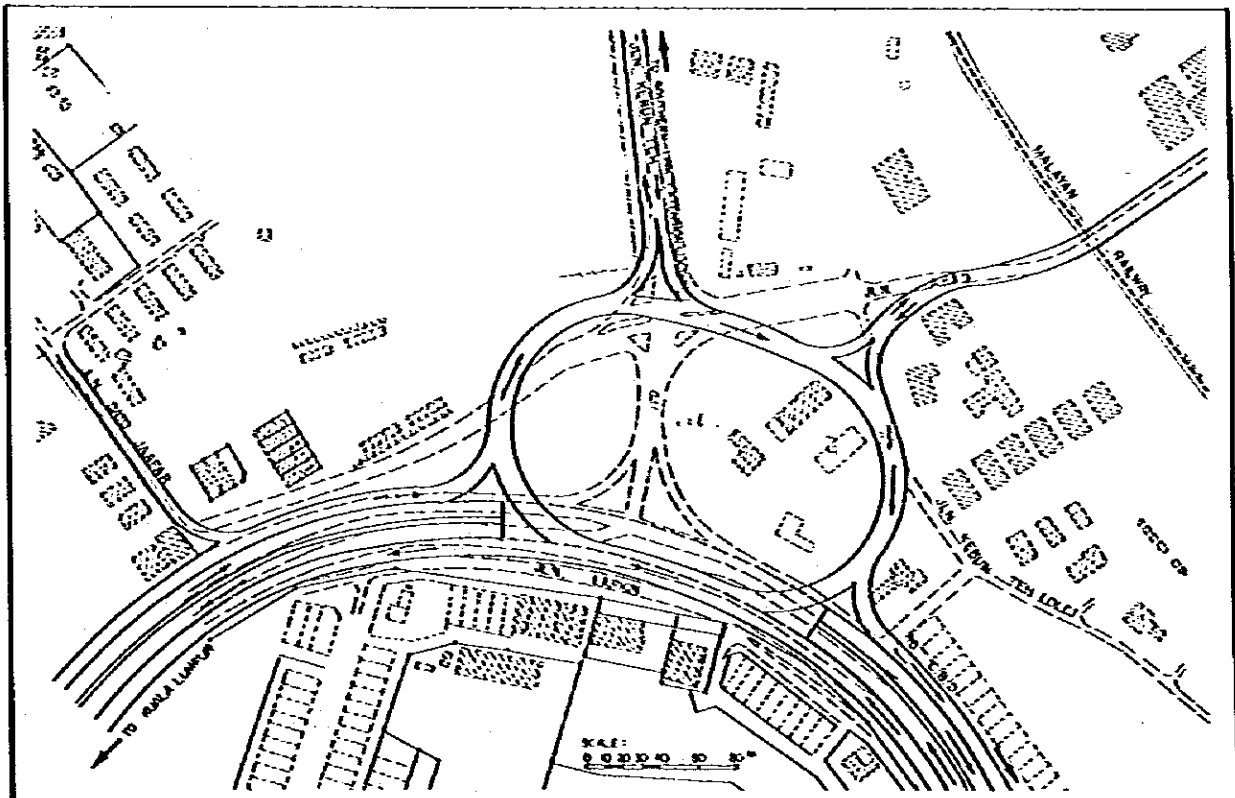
INTERSECTION IMPROVEMENT PLAN AT THE INTERSECTIONS OF JLN KEBUN TEH WITH JLN LARKIN AND JLN ABAD (PLAN 'B')
